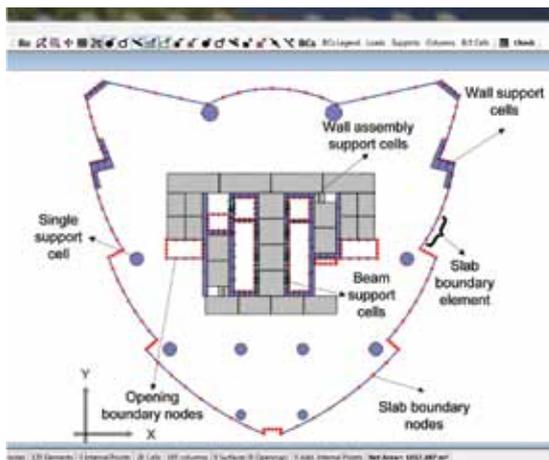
An example of a boundary element model for a complex floor plate. Discretization is required only at the slab and opening boundaries. Columns, beams, and walls are modeled as support cells
